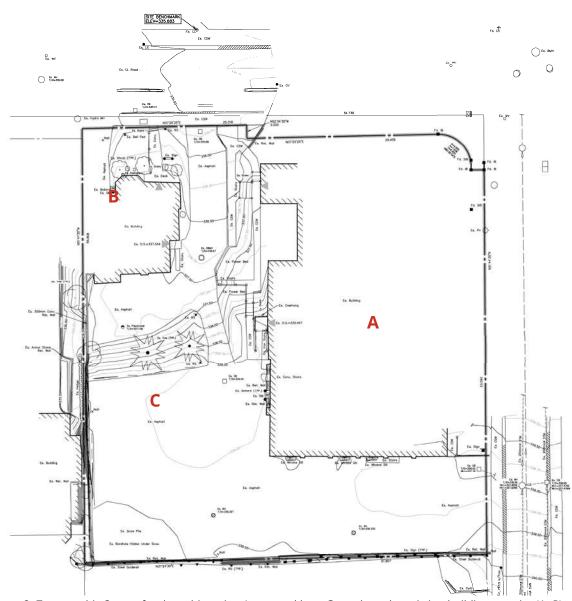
Topographic Survey for the subject site. Annotated by mCs to show the existing buildings on site (A, B) and location of the proposed affordable housing building C. (Source: MTE, January 2023)
